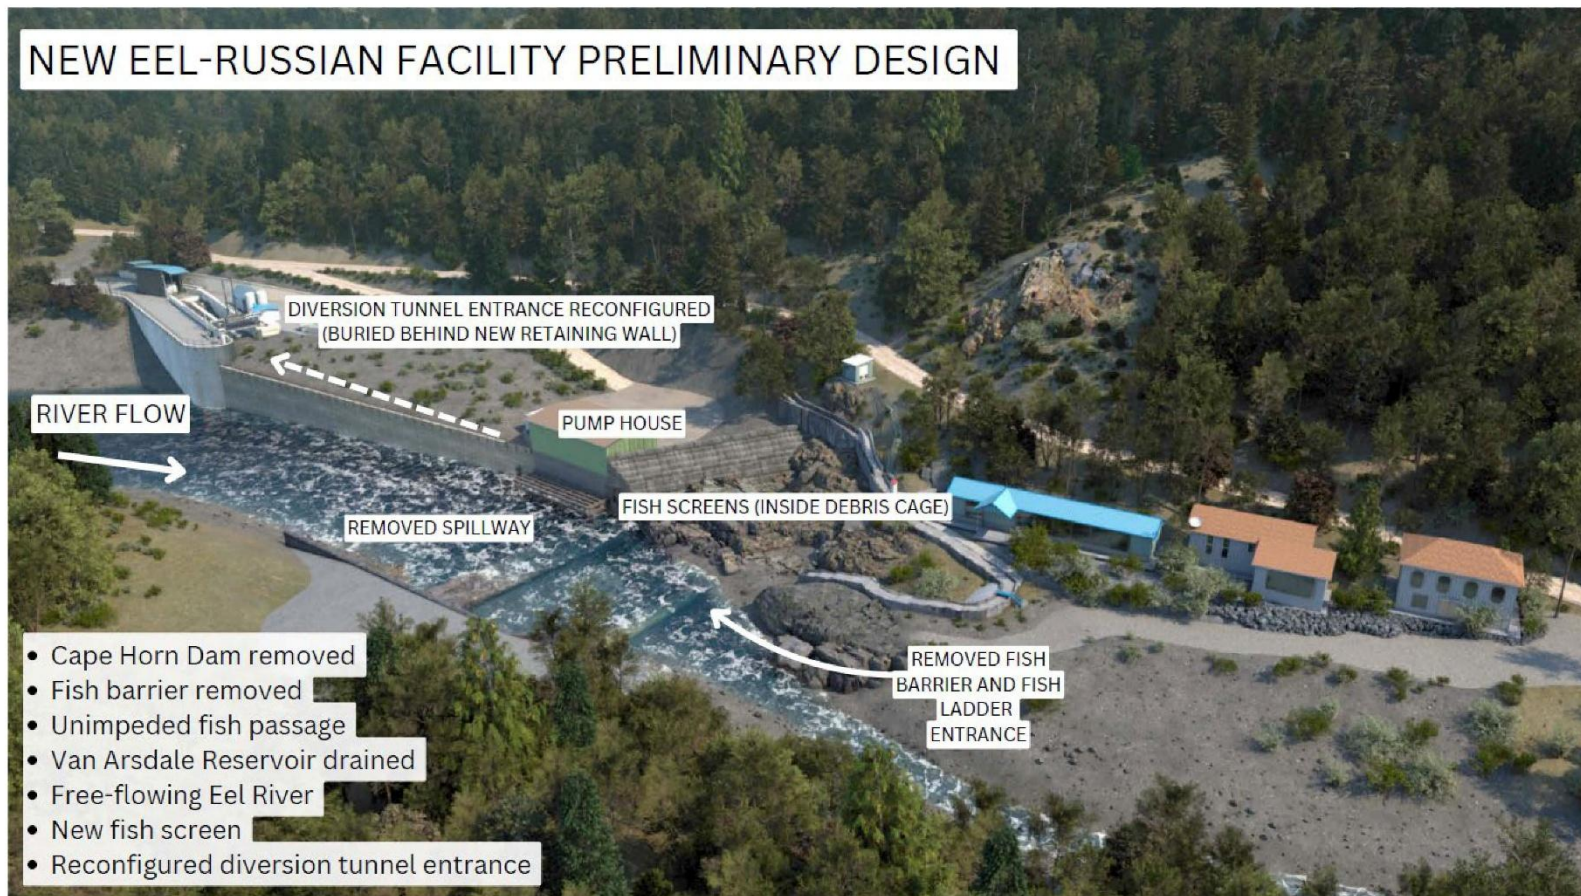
NERF preliminary design upstream of deconstructed Cape Horn Dam (artist rendering).
